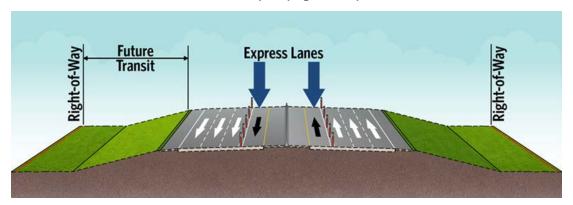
TBX Starter Project Proposed Typical Section (Segment C)
